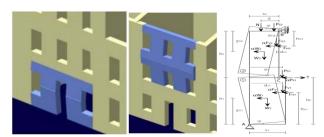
Vertical wall out-of-plane failure mechanism [112]
